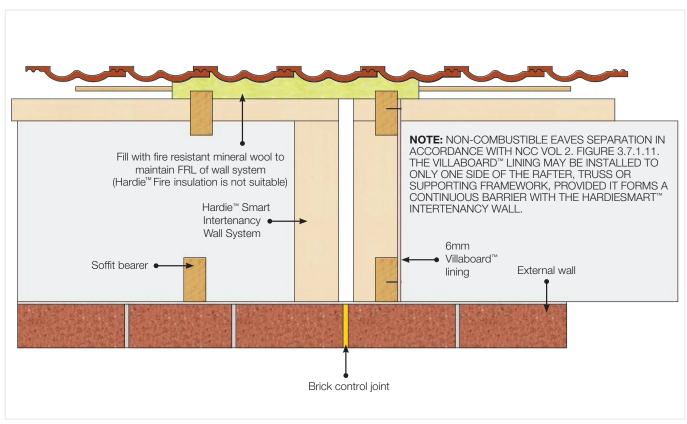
CROSS SECTION OF EAVES SEPARATION AT LINE A
